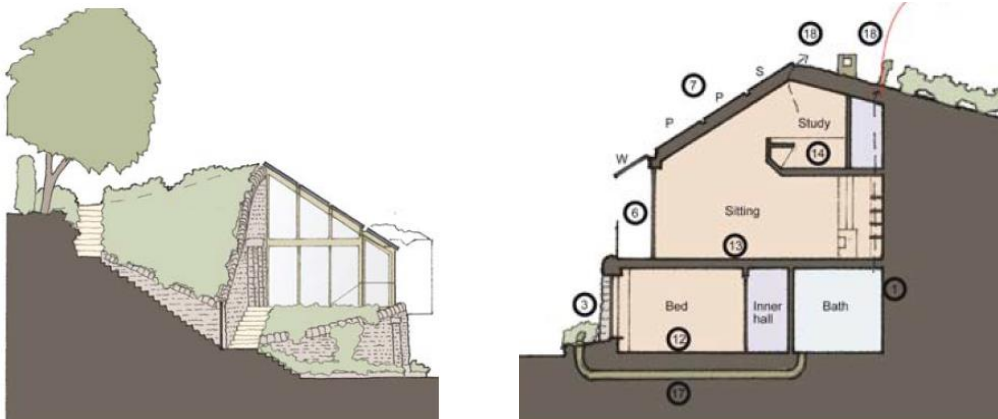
(a) West Elevation ; (b) Section with numerical reference to rooms/design features
